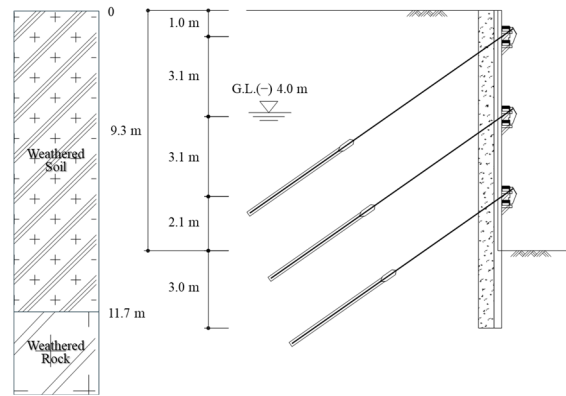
Cross section of temporary earth retaining wall and soil profiles at Icheon site.
